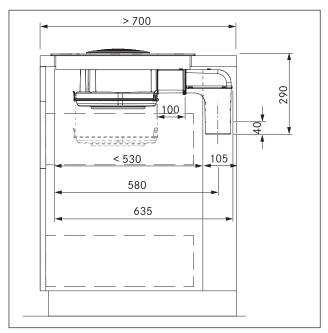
Installation dimensions for exhaust air, worktop depth 700 mm
